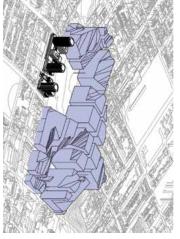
Indicative envelope with existing and future street network subtracted
